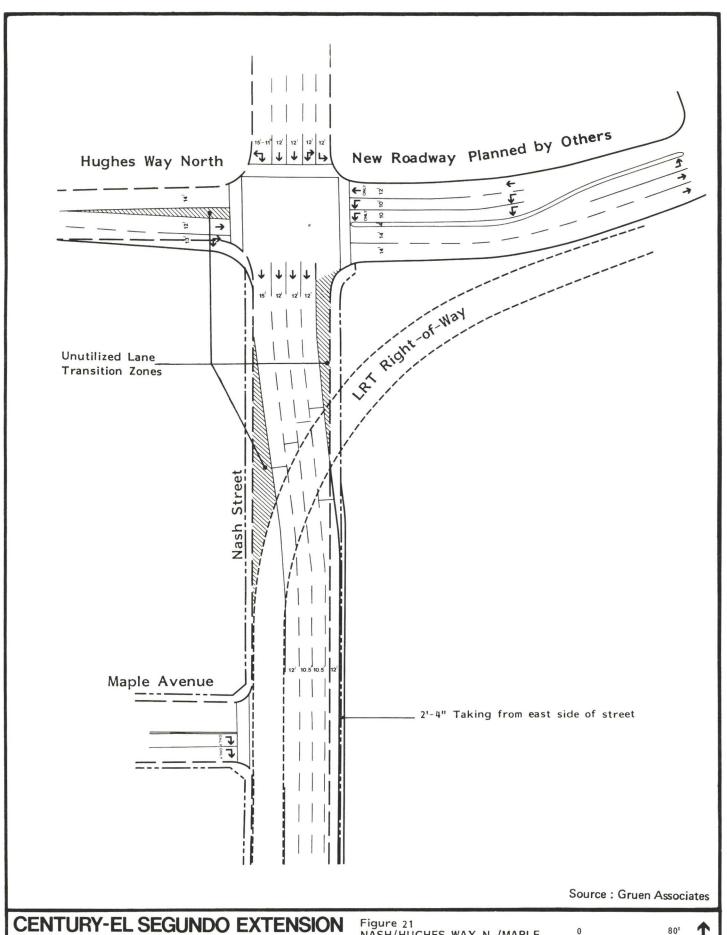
through 24 illustrate proposed improvements to Nash Street that would be required to mitigate LRT impacts to acceptable levels of traffic service. Figure 25 shows typical cross-sections through this section of Nash Street.
